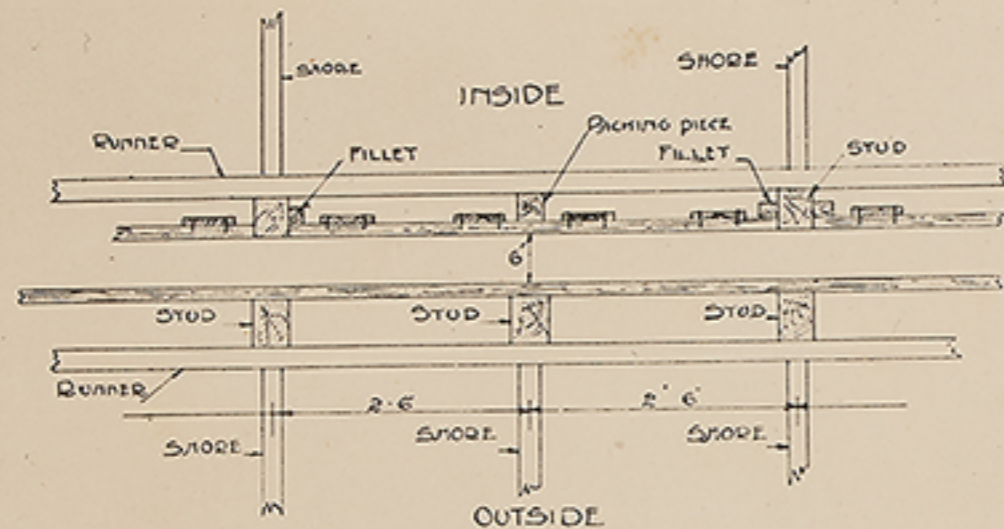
Plan and Cross Section of Shored-up Form for Wall
